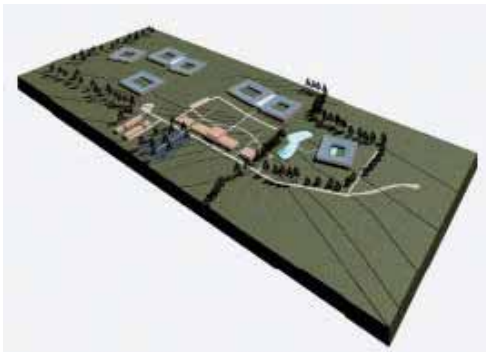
Lake and pond in Fachkrankenhaus Nordfriesland Hospital
